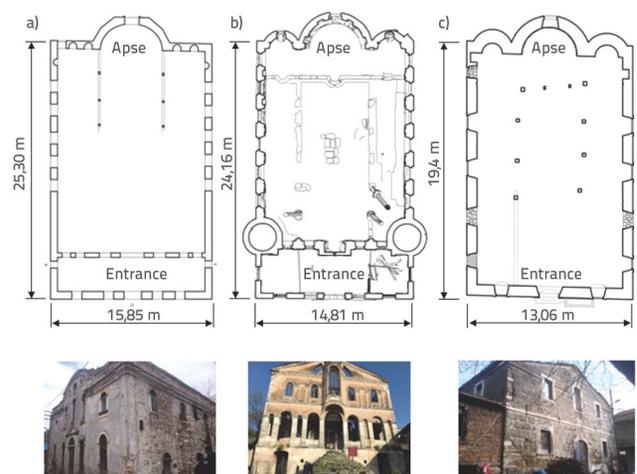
Plan views and photos of entrance facades of: a) Aydınpinar Church, b) Dereköy Church, and c) Ballıpınar Church
